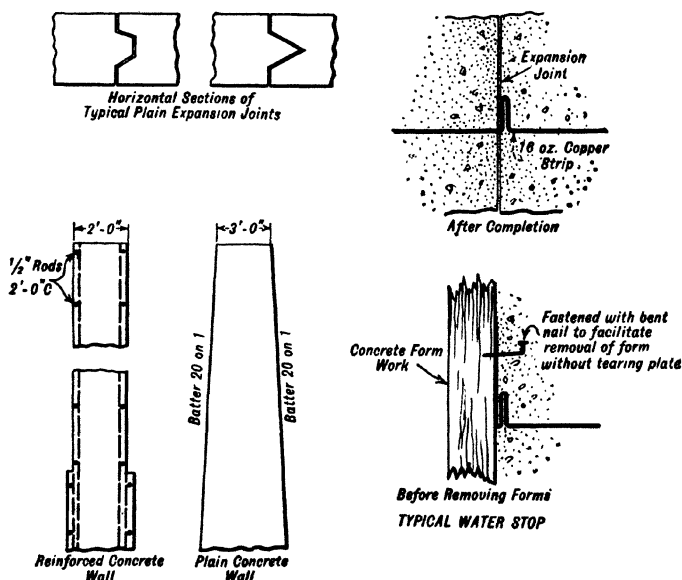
Typical Concrete Core-walls, Cut-offs and Water Stop.
